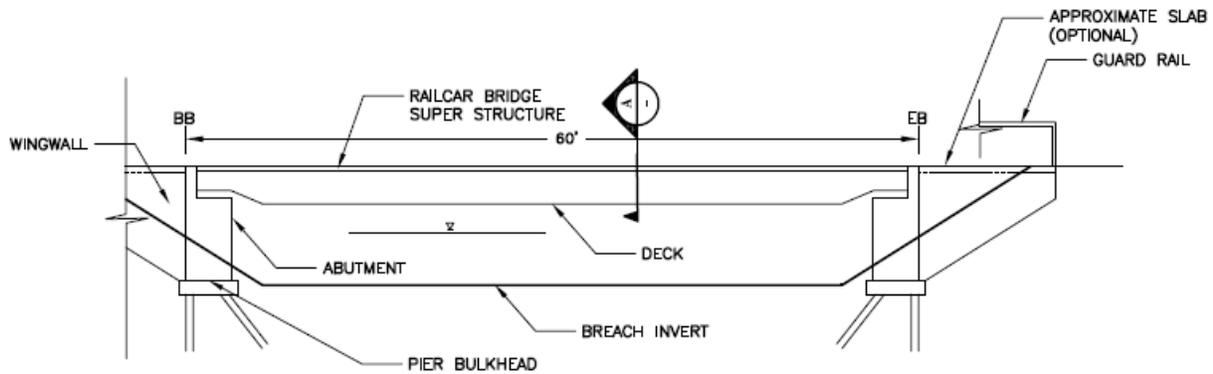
Proposed Rail flatcar Bridge – Typical Section.
